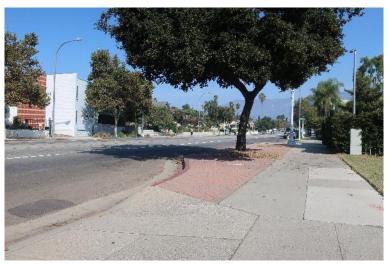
Sidewalks - Mixed Use Corridor (MUC) Typical or Curb Extension Condition
